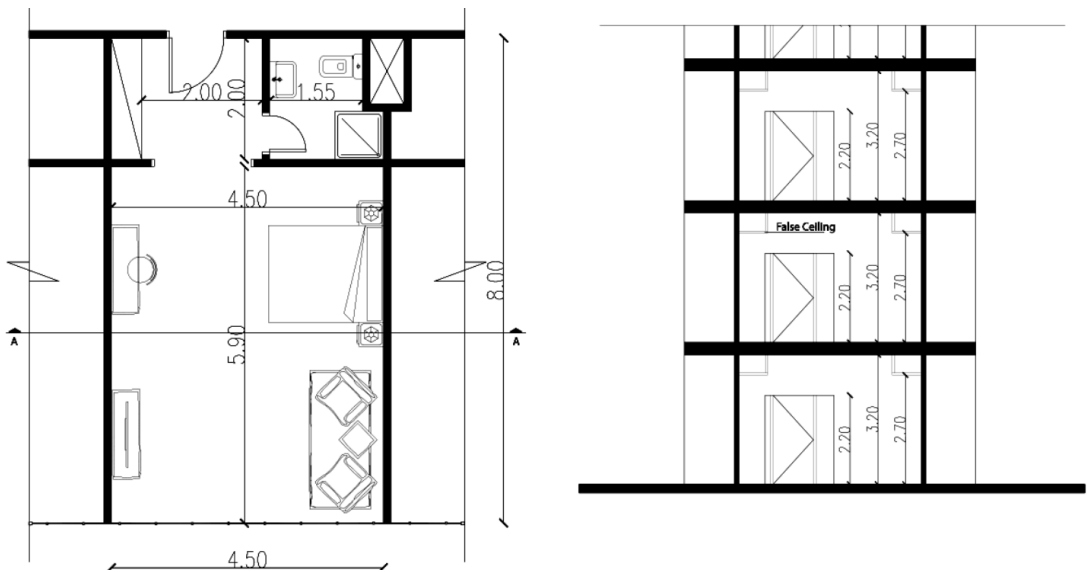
Plan of Reference Case (Left) and Section (A-A) Passing through Plan (Right)
